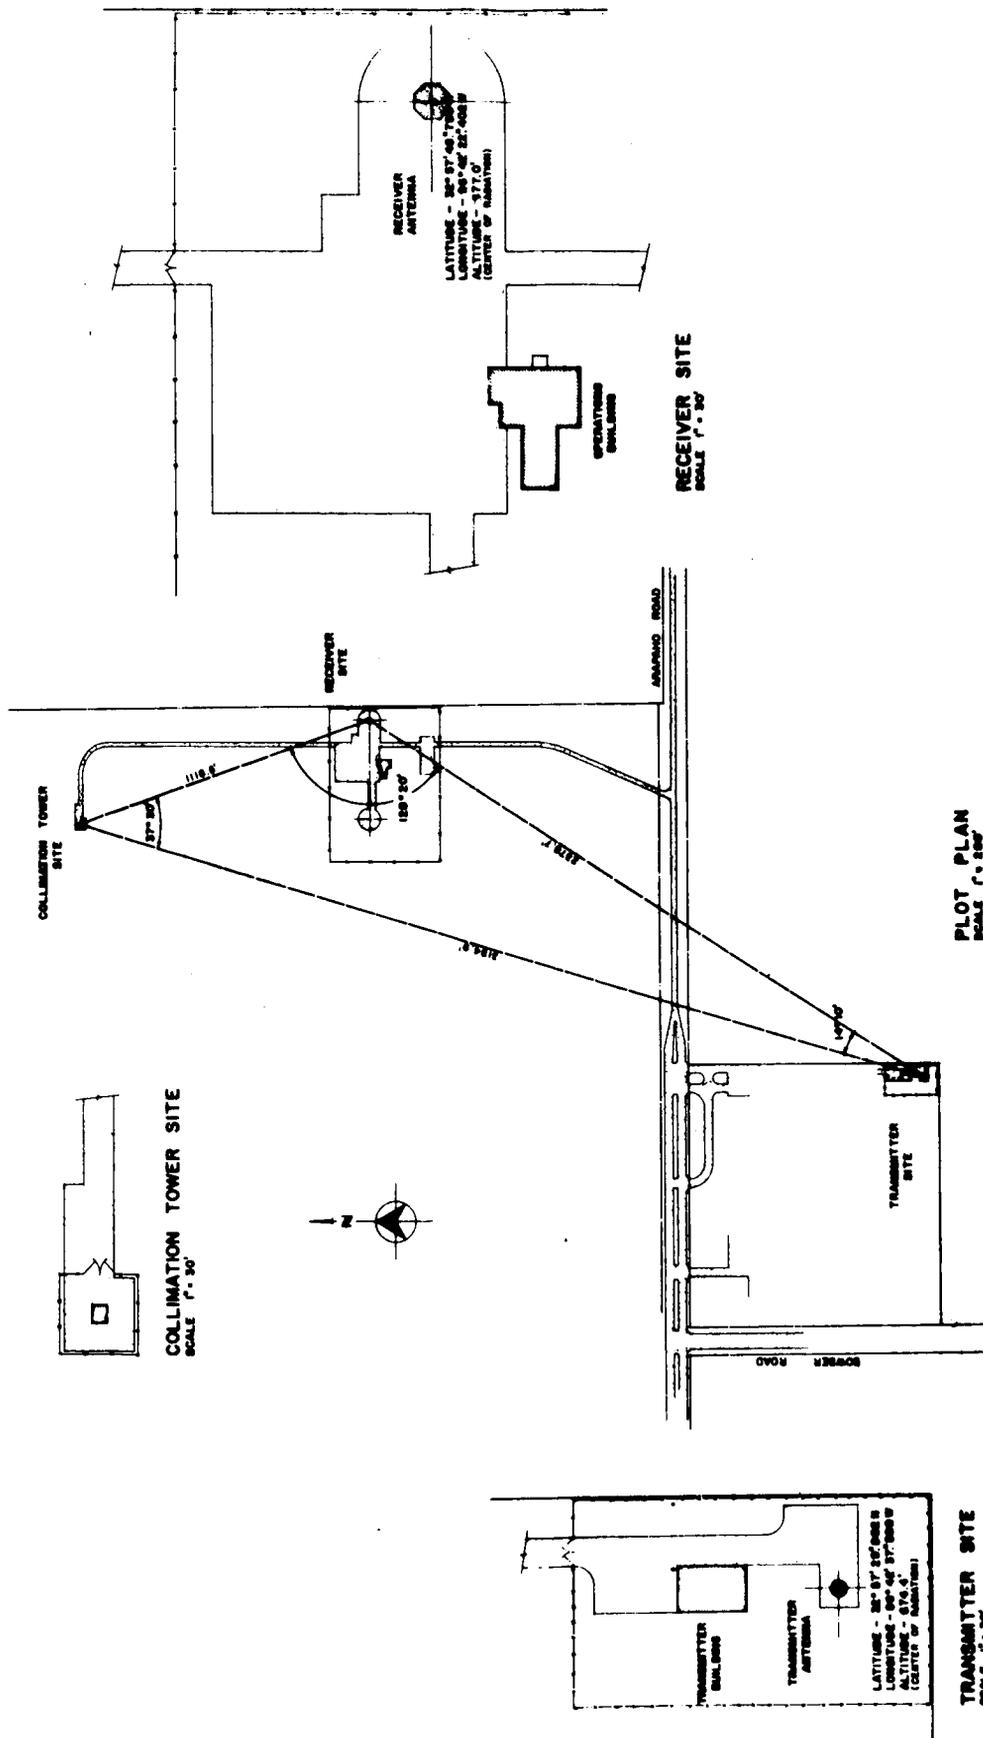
Site Plot Plan, Collins (Dallas) Facility
